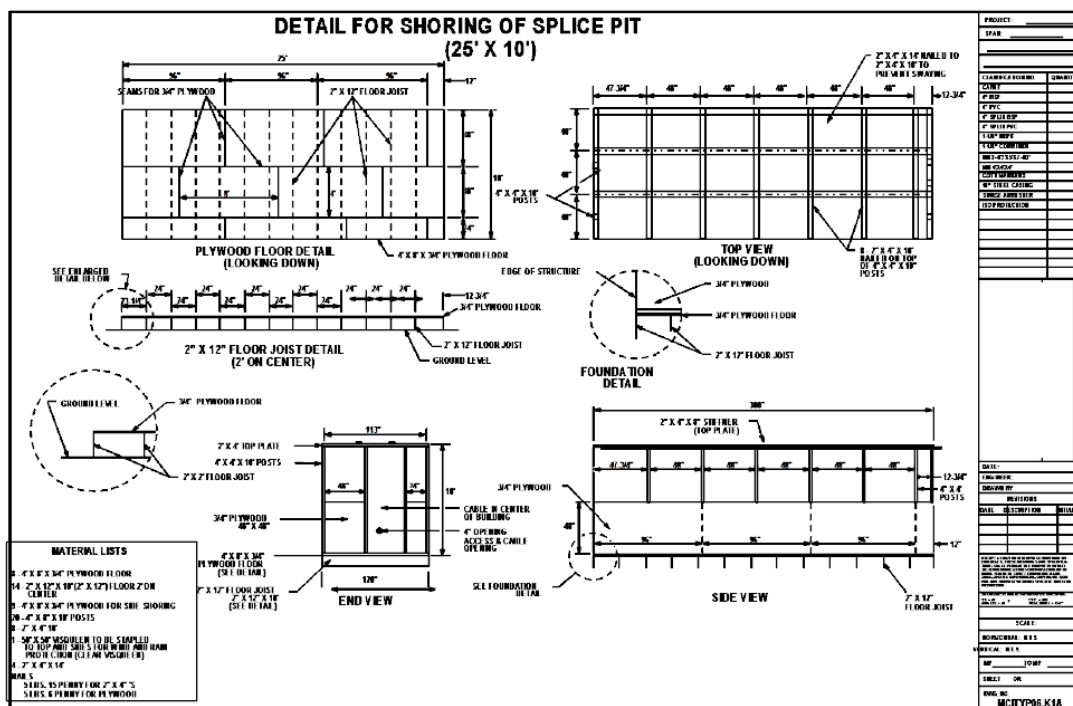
Detail for Shoring of Splice Pit (25' x 10')
